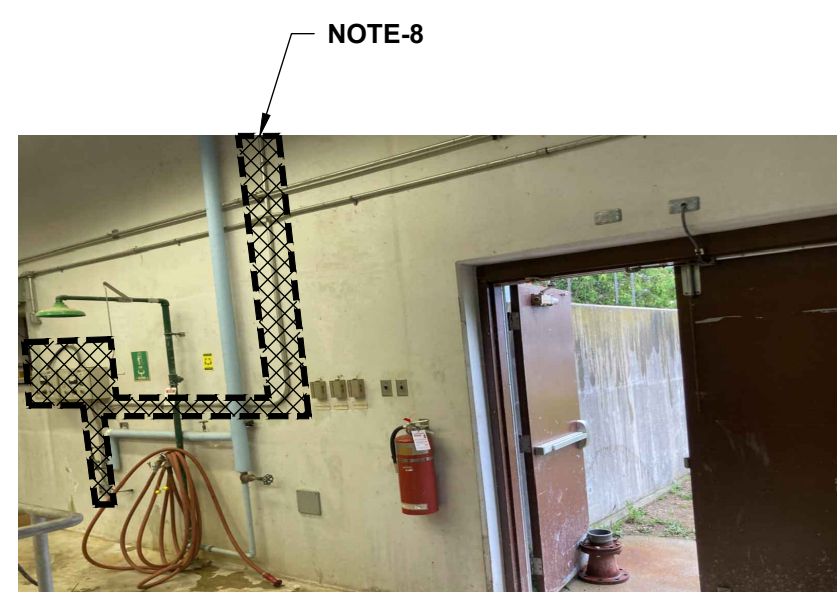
FERRIC PUMPS METERS BLOWER ROOM
